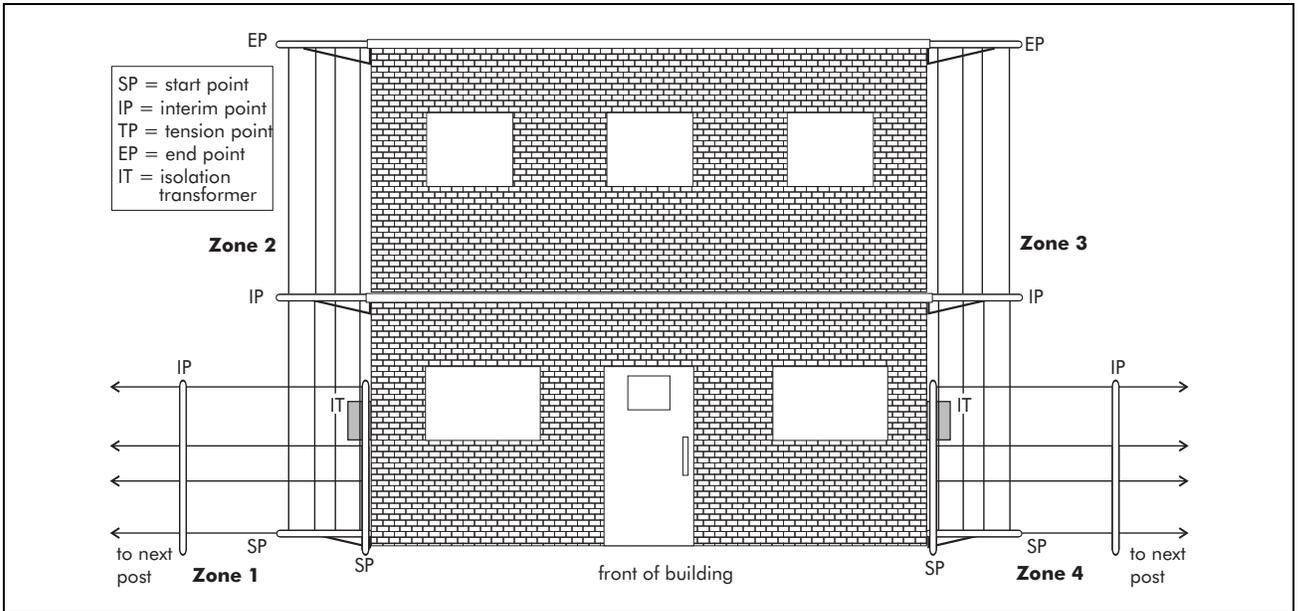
Vertical wall-mounted configuration (building is part of perimeter)
